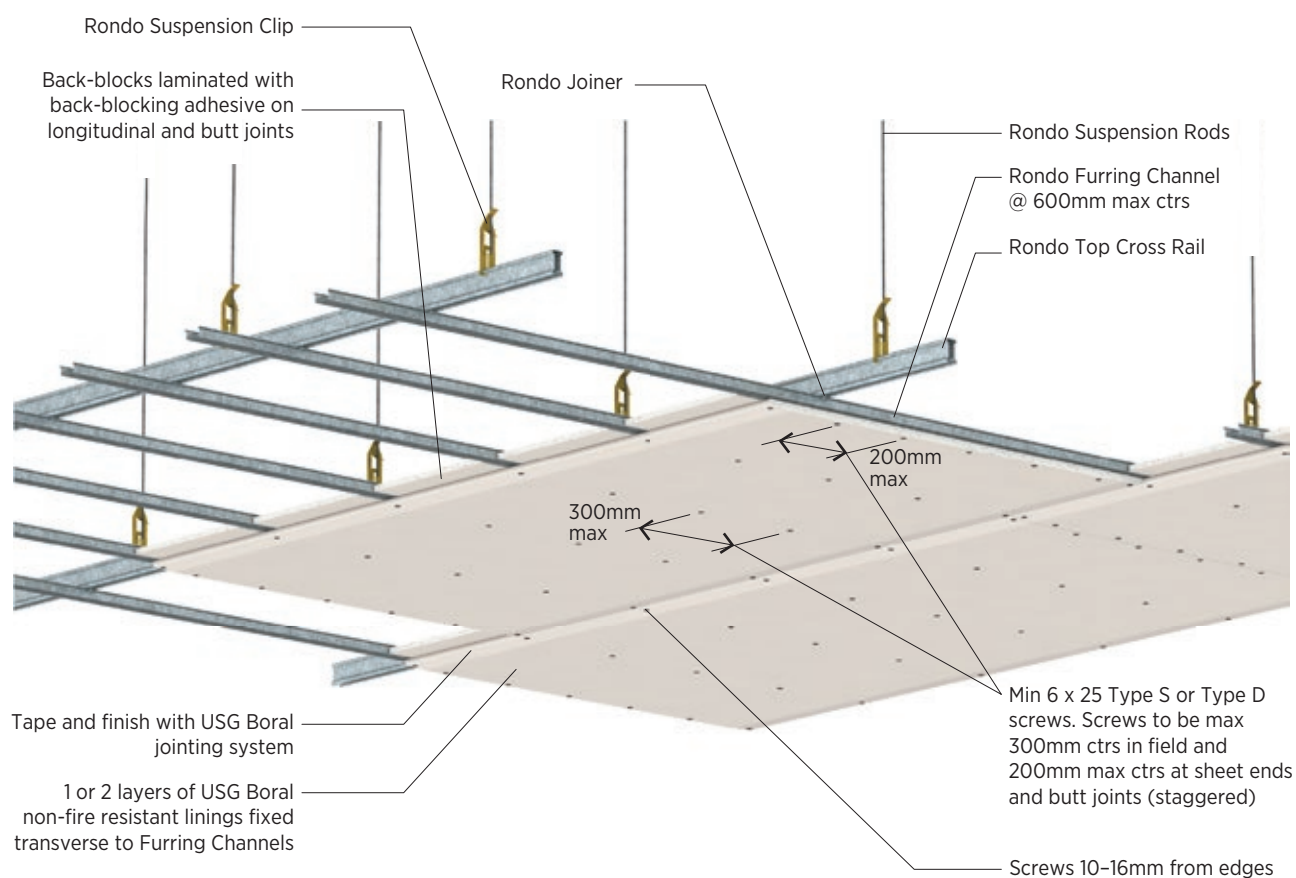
Non-Fire-rated Ceiling – Screw-fixing Layout
